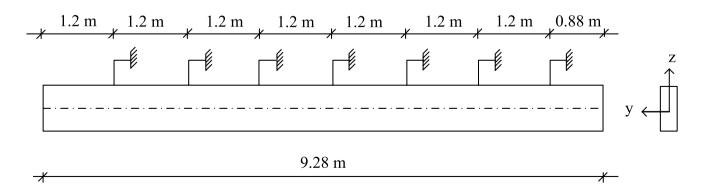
Discrete bracing of the roof beam at the upper level of the beam (compressive edge) with lateral supports
